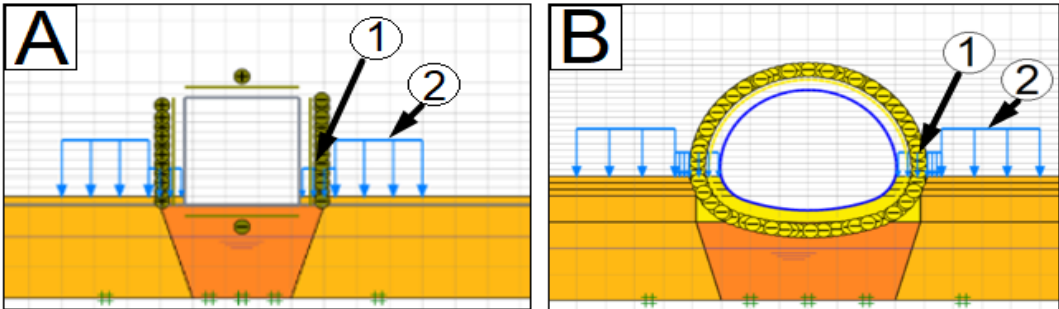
The compaction procedure used for A) a concrete culvert and B) a flexible steel-soil composite culvert showing that the compaction loads are defined as ① «light compaction» and ② «medium compaction»
